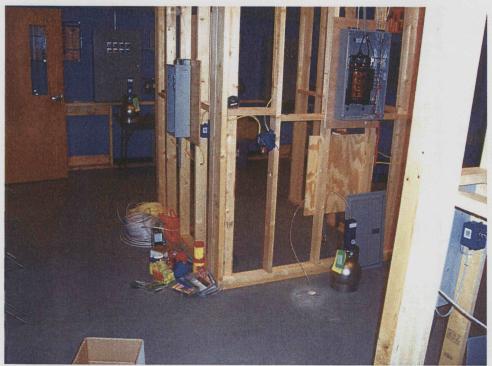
Training Facility Building, 1st floor northeast, sub-slab sampling.
